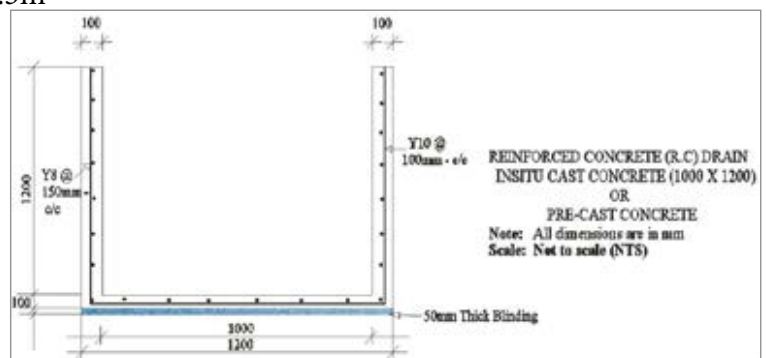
Details of reinforced concrete or pre-cast concrete drain
